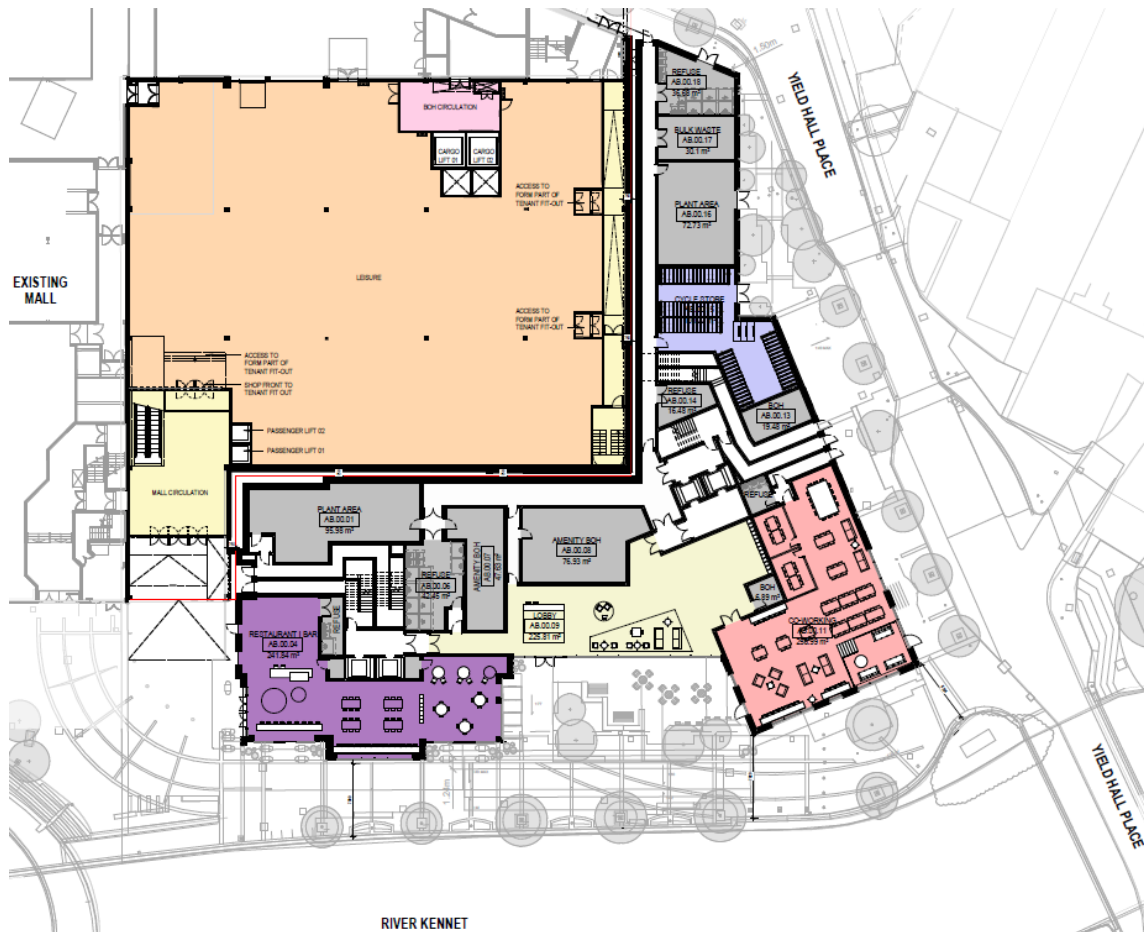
YHP1 - Proposed Ground Floor Layout Plan - Large proposed leisure use unit shown shaded orange (double height unit with double height new retail unit above), proposed restaurant unit shown shaded purple, proposed co-working space shown shaded pink, new riverside entrance to the proposed leisure and retail units shown shaded yellow and back of house and plant rooms shown shaded grey
